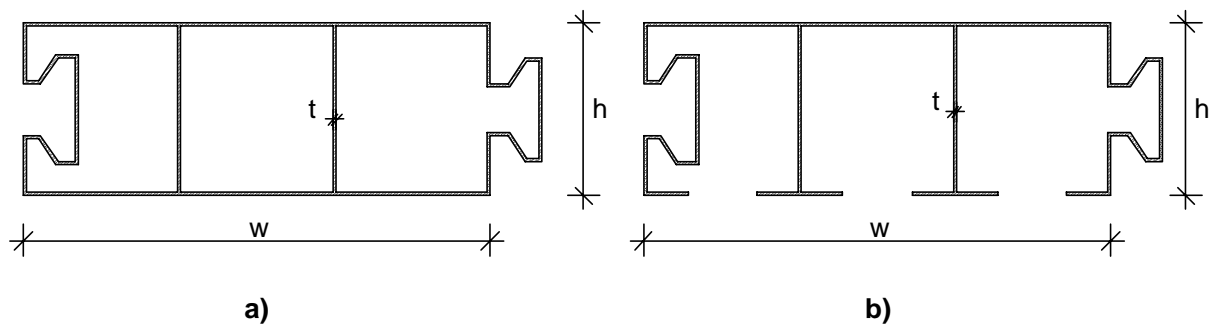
Cross-section of the bridge-decks, a) closed, b) open
